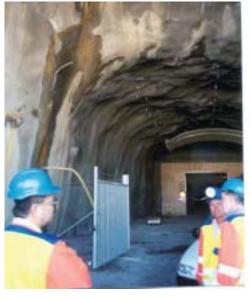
Site visit to a rock tunnel portion of the Southern Link road construction project.
